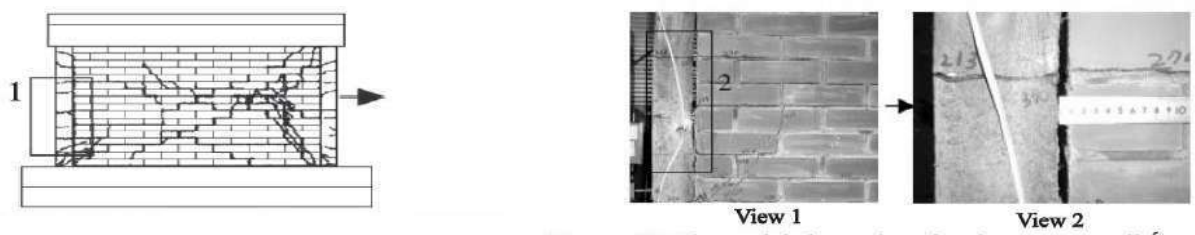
Flexural failure of confined masonry walls
